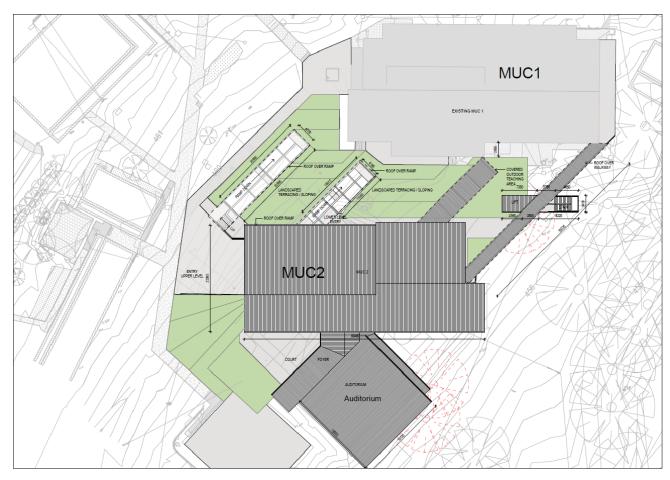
Layout depicting location of MUC2 relative to MUC1 and connective pathways
